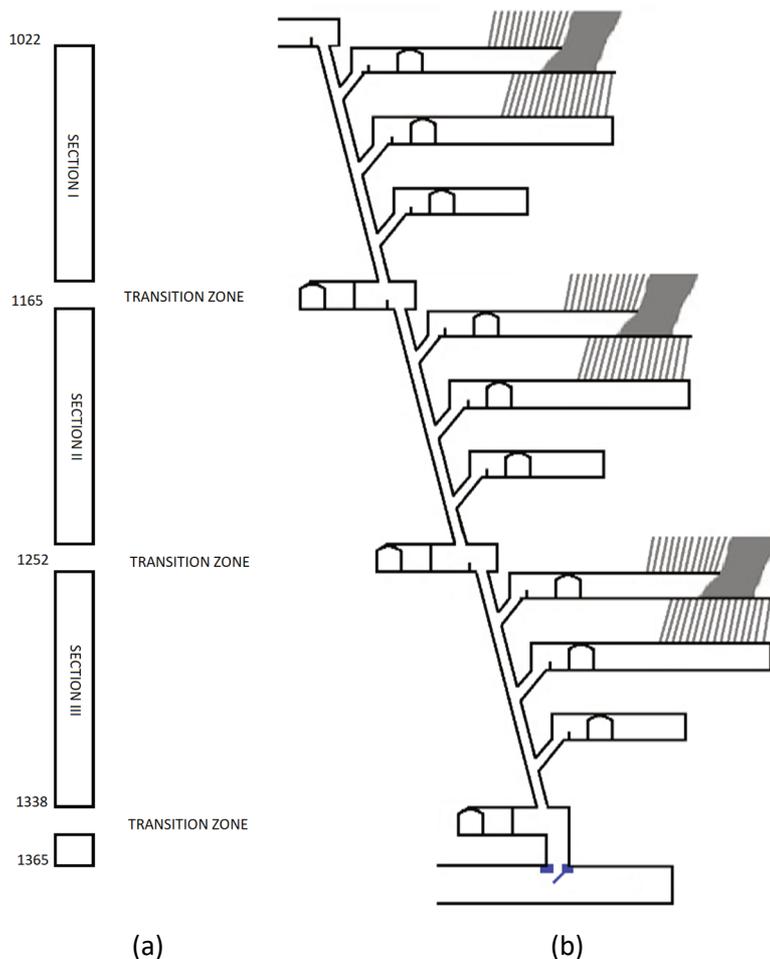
Orepass schematic of Kiirunavaara Mine, divided into sections. (a) Front view; (b) Side view
